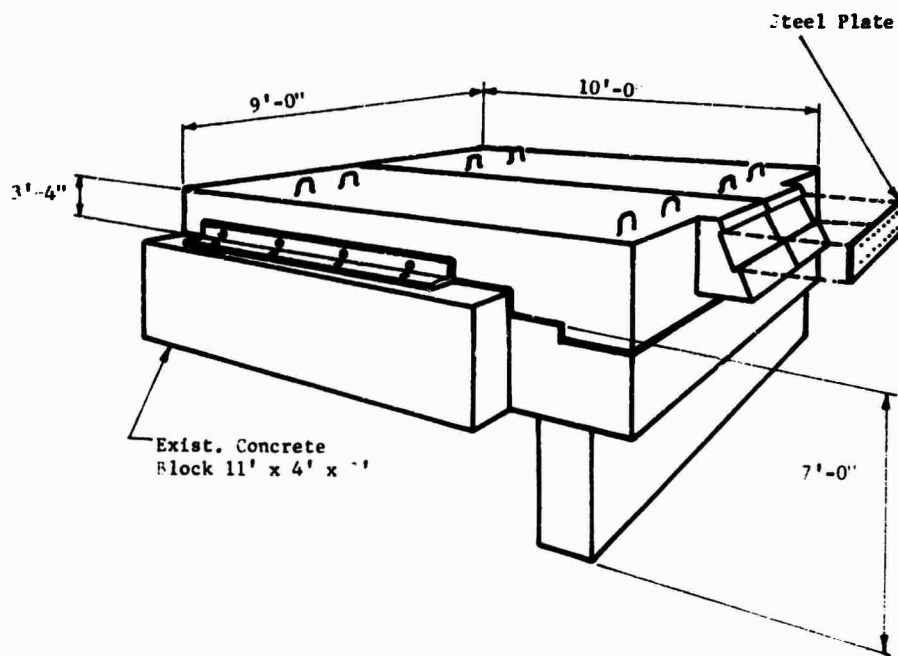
ISOMETRIC VIEW OF CONCRETE ABUTMENT
